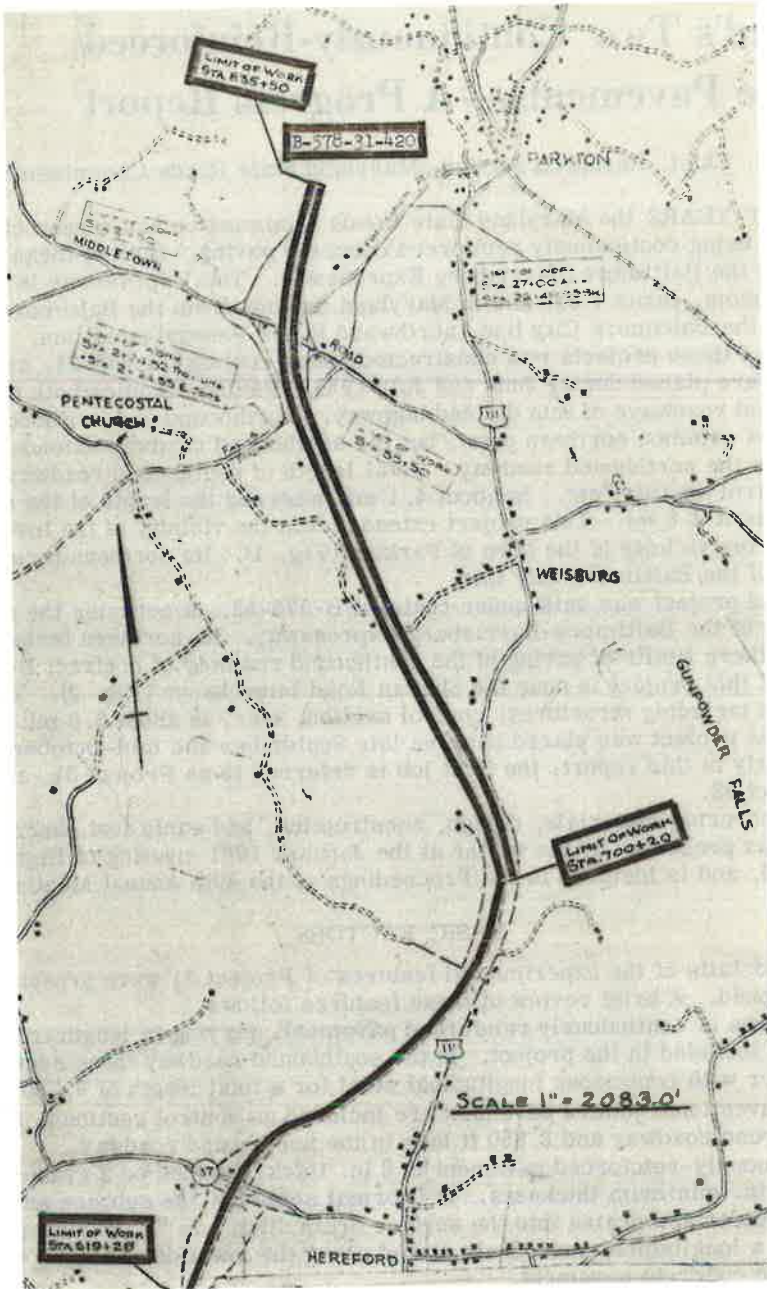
General location of experimental continuously-reinforced concrete pavement, Project 31.
